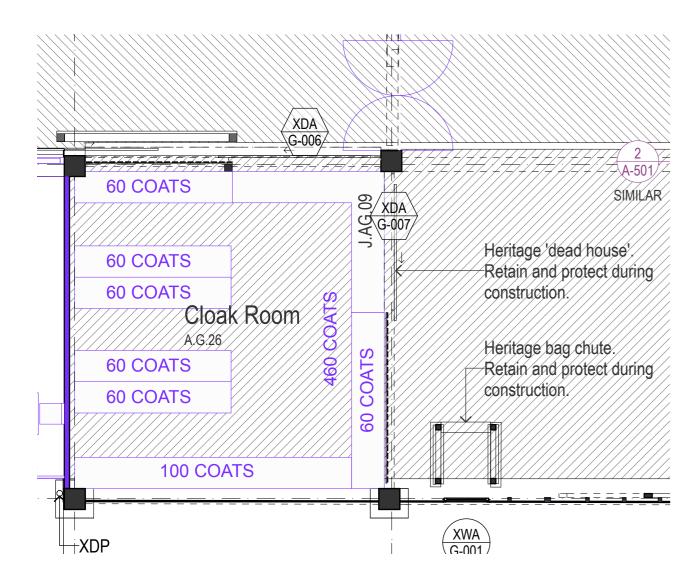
Pier 2/3 Cloak Room in former Dead House, plan
